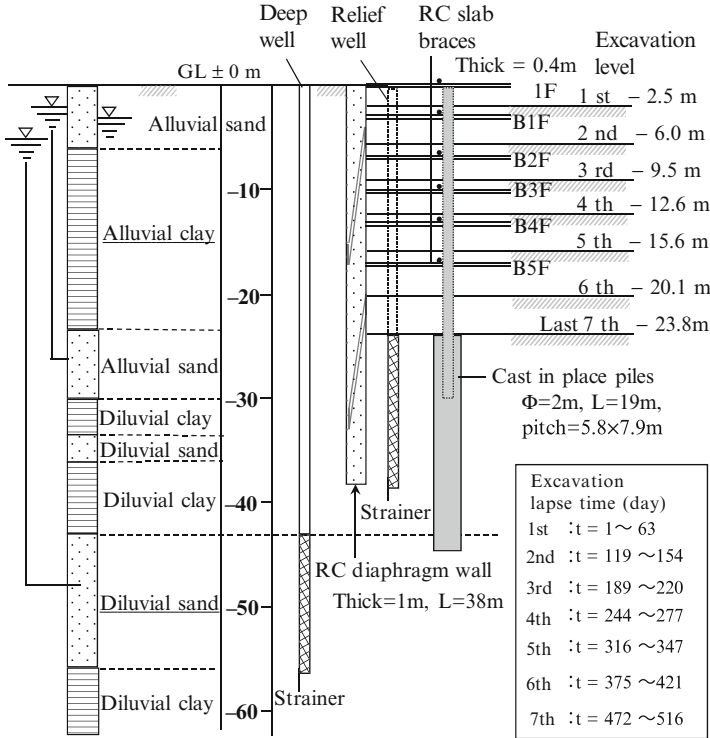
Brace system of reverse concreting and pumping well installation for excavation work
